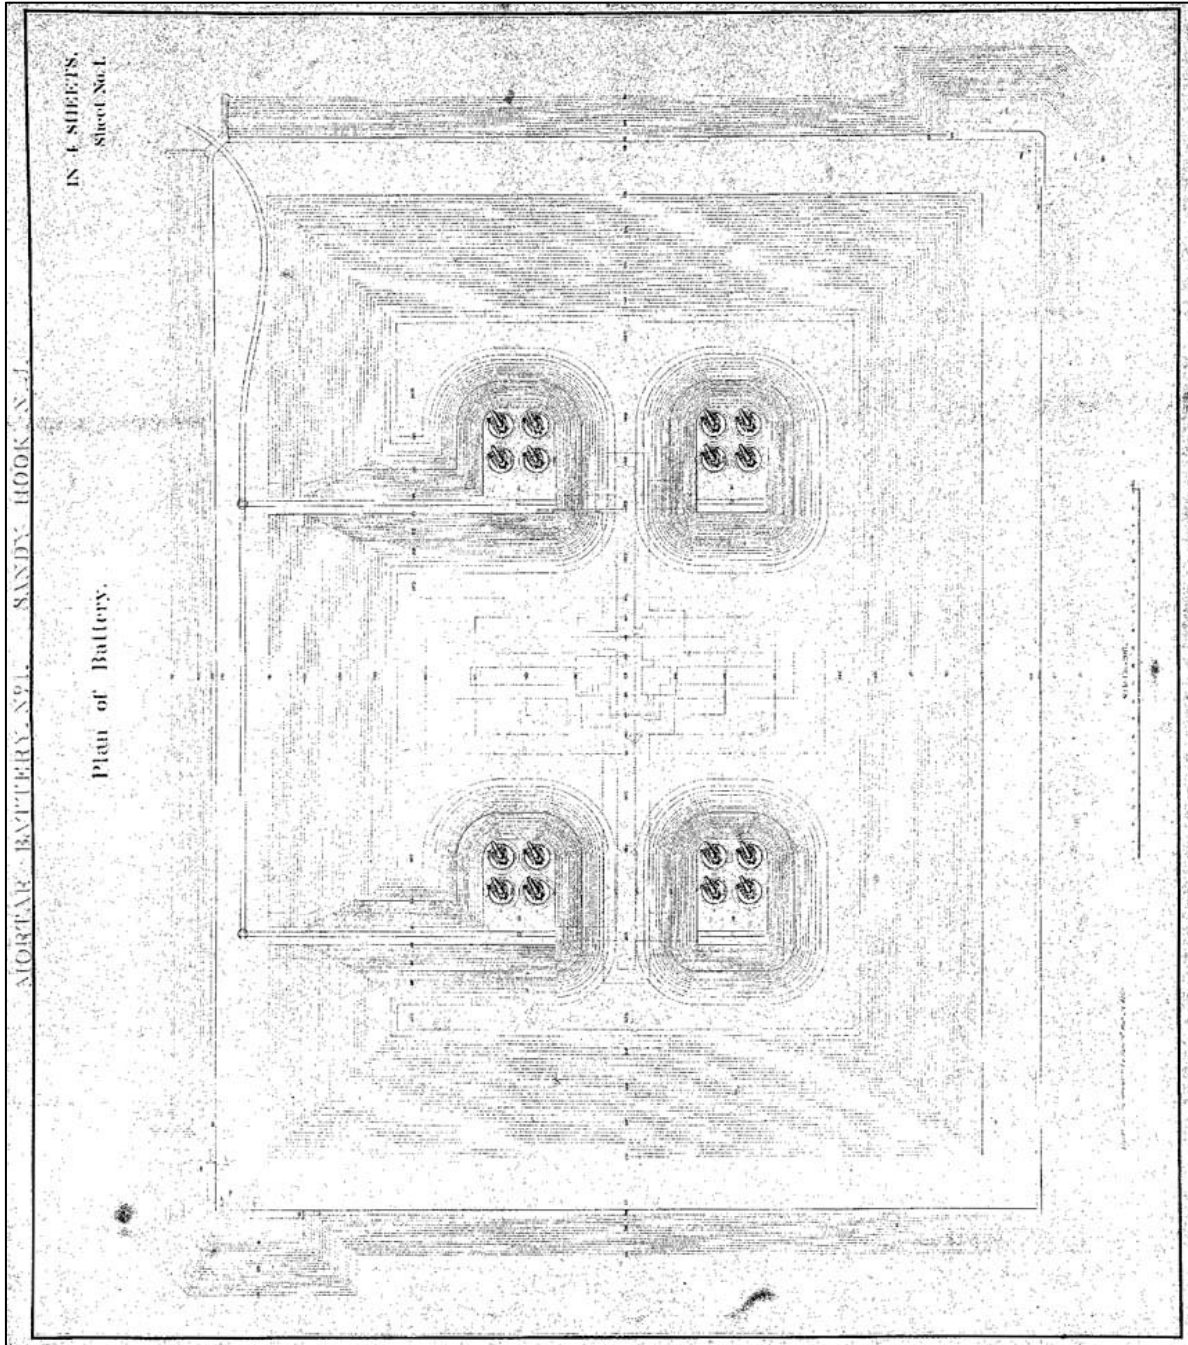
"Mortar Battery No. 1, Sandy Hook, N.J. Plan of Battery." Sheet no. 1 of 4, 1895.
